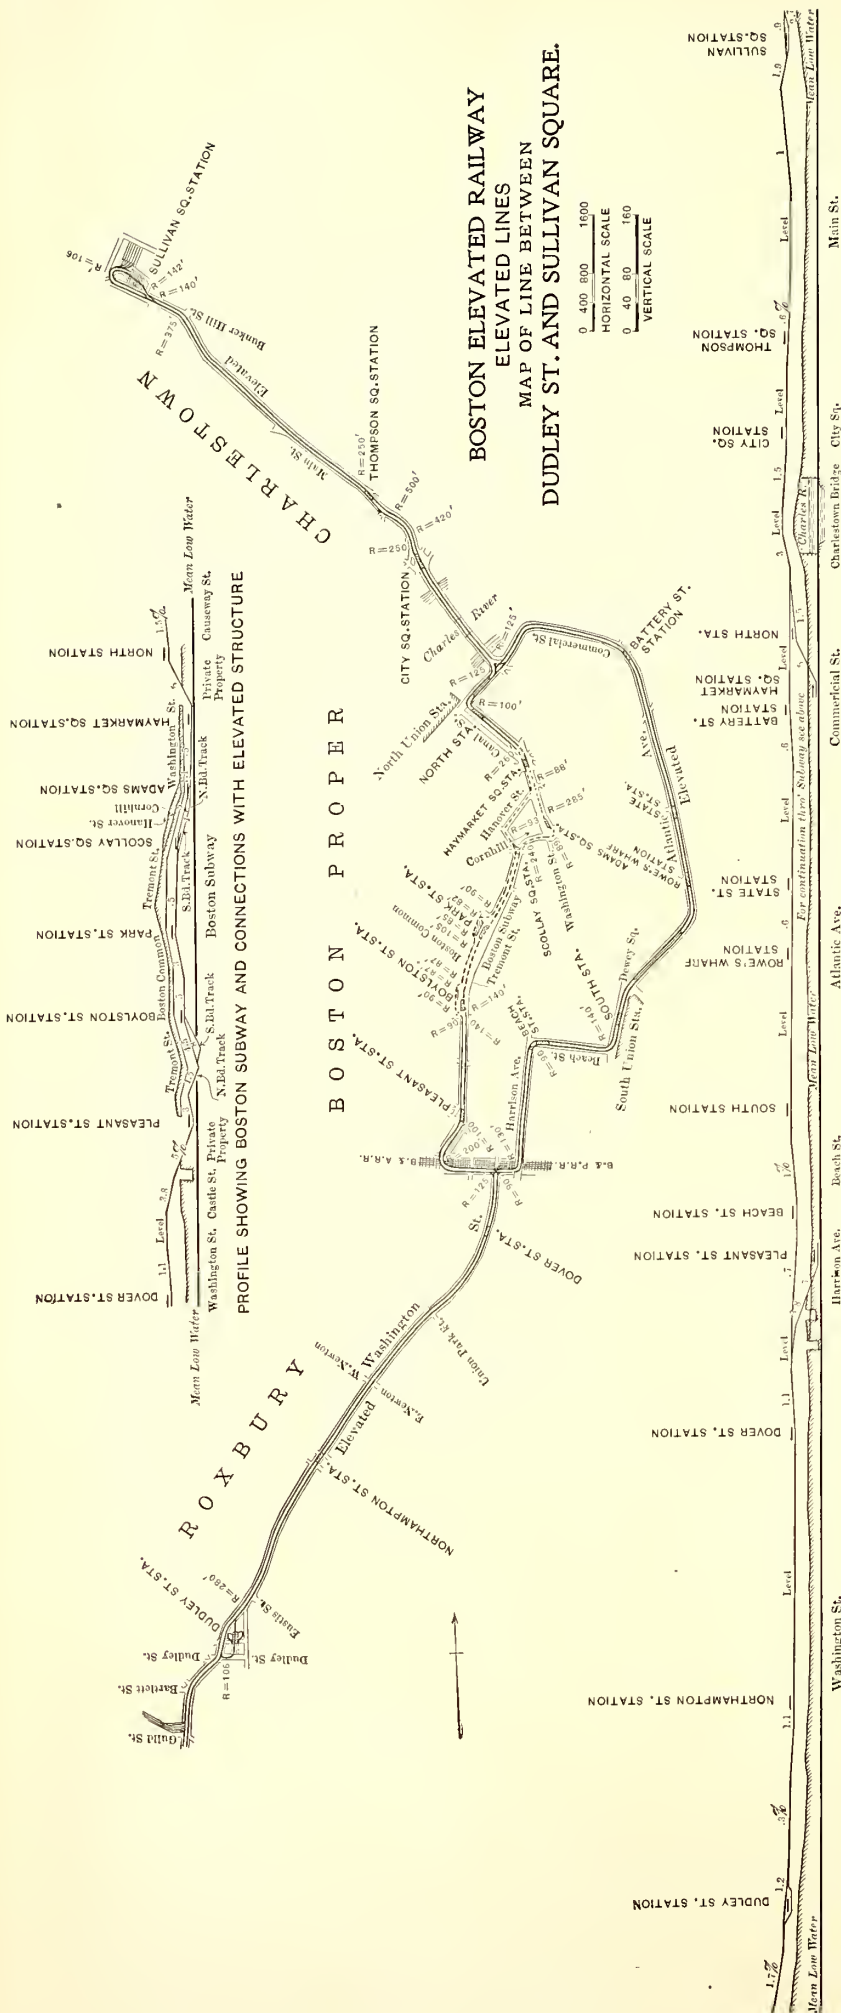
PLAN AND PROFILE, SHOWING ELEVATED STRUCTURE FROM DUDLEY STREET, ROXBURY, TO SULLIVAN SQUARE, CHARLESTOWN, VIA ATLANTIC AVENUE AND SUBWAY
